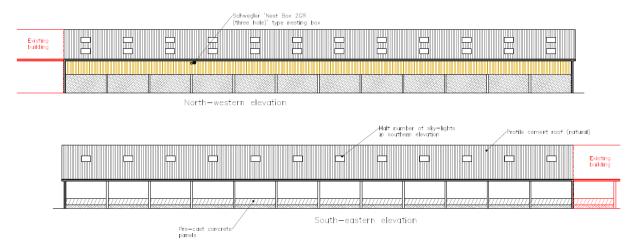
Building A – Proposed North-Eastern Elevation and South-Eastern Elevation
